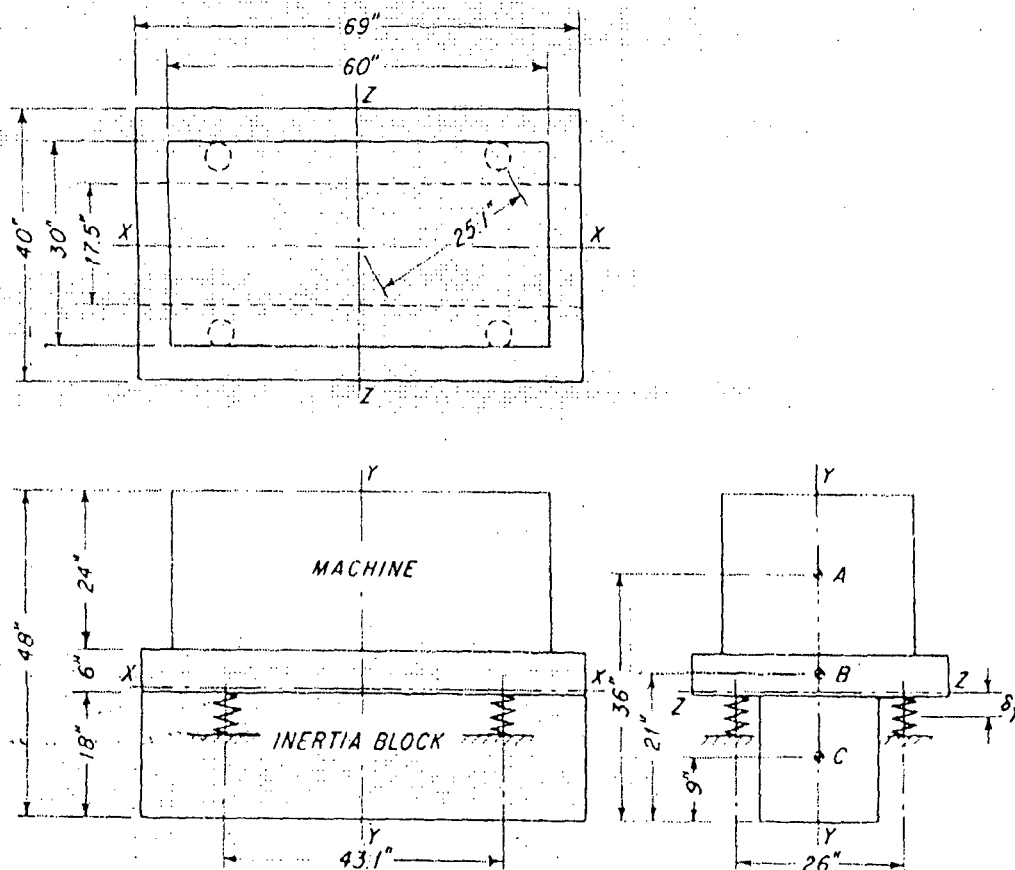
Mounting method in which machine is secured to inertia block whose end view is T-shaped and which is supported by isolators.
